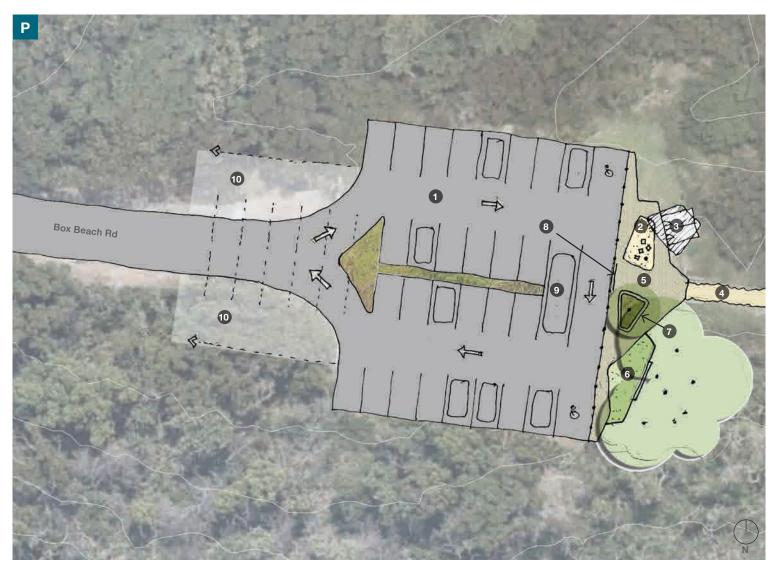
Proposed carpark upgrade at Box Beach Precinct
